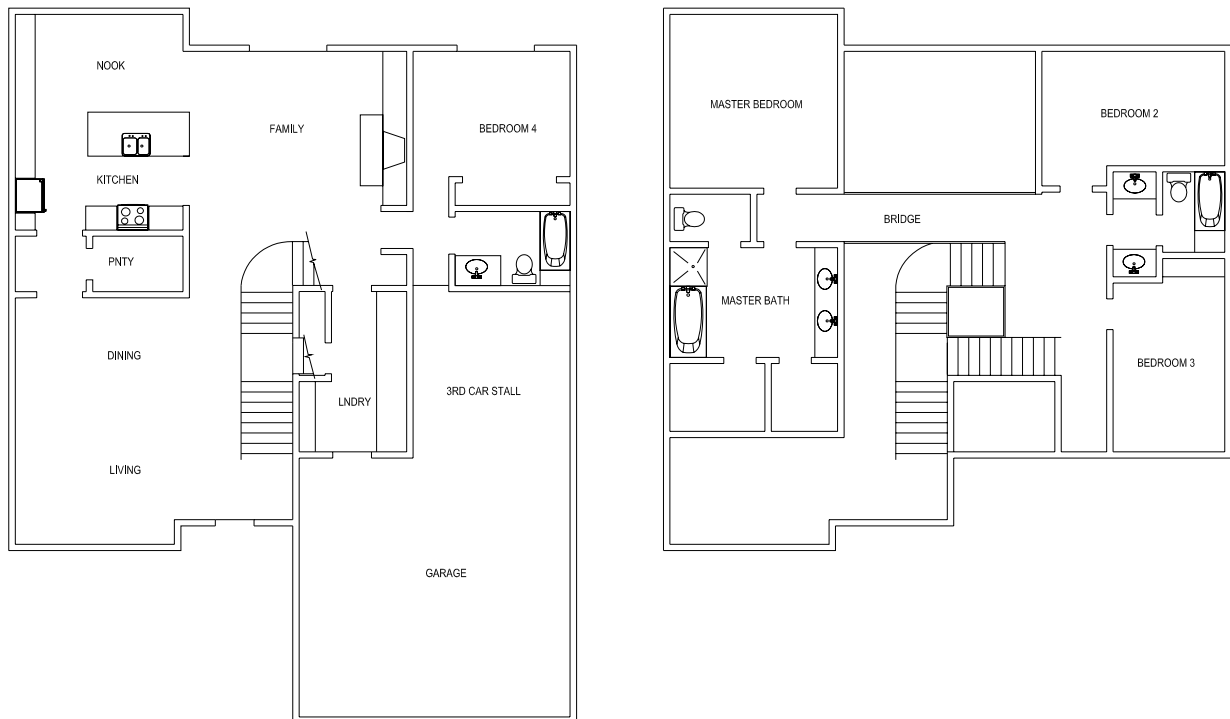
House #3 - Floor Plan (first floor/left, second floor/right)
